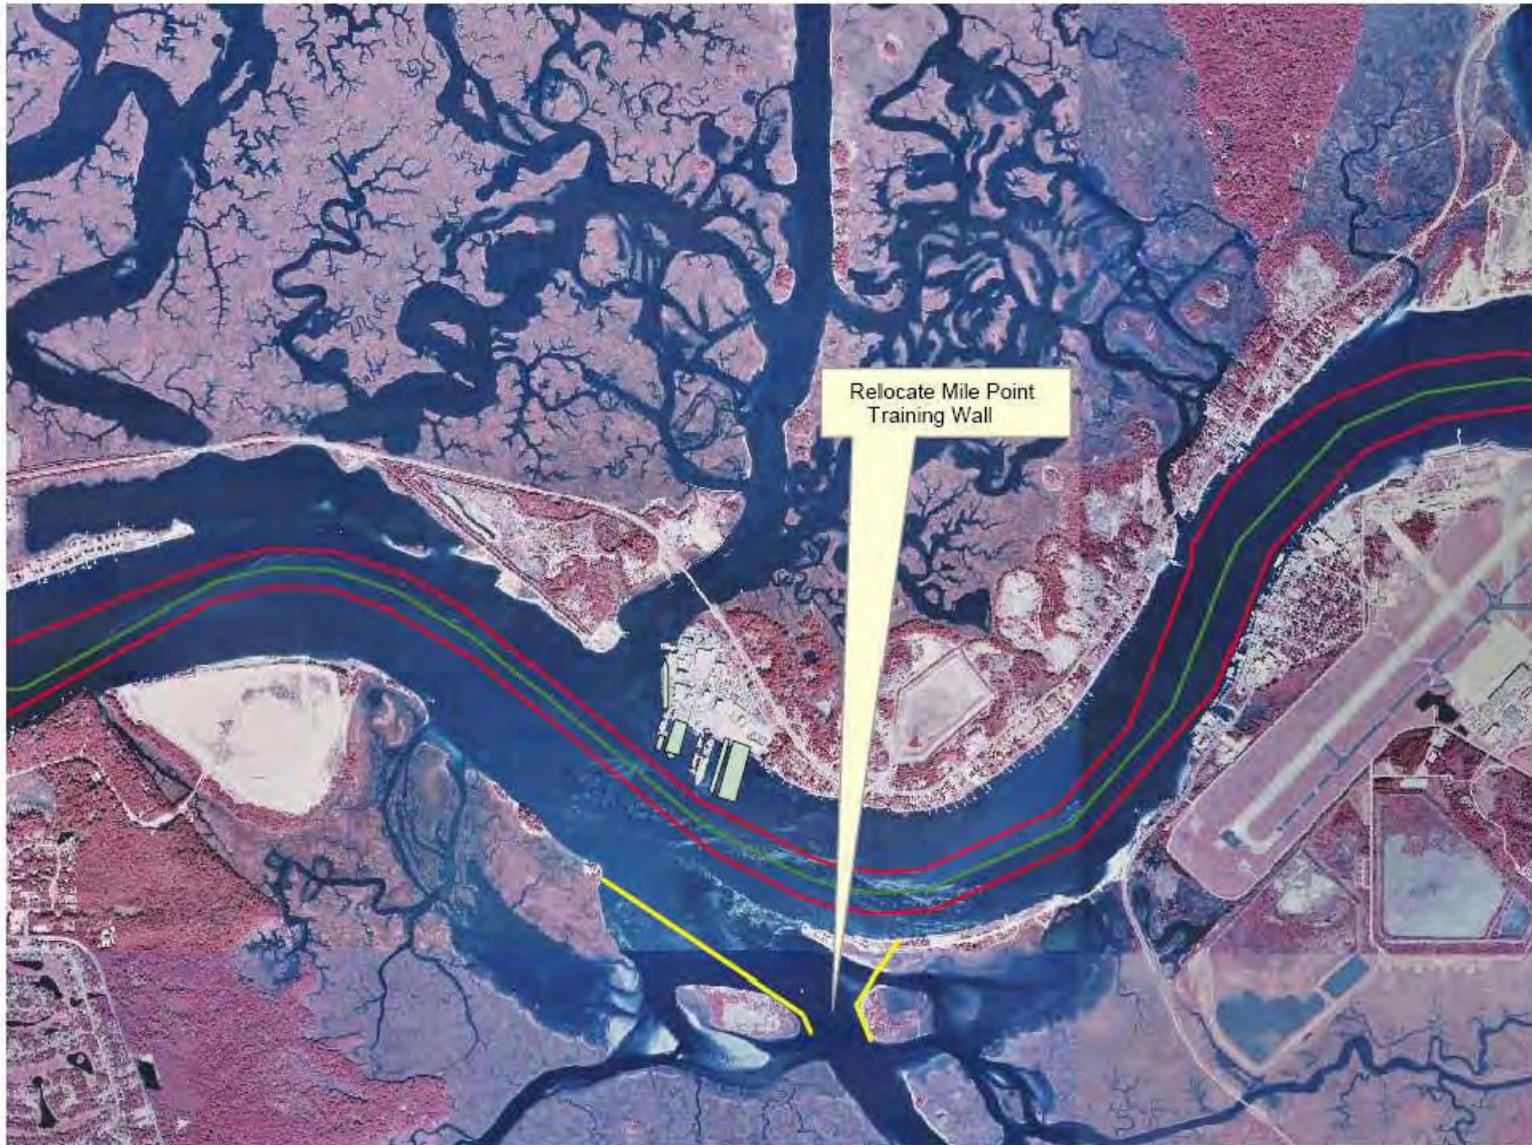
Proposed Alternative: Relocate Mile Point Training Wall
